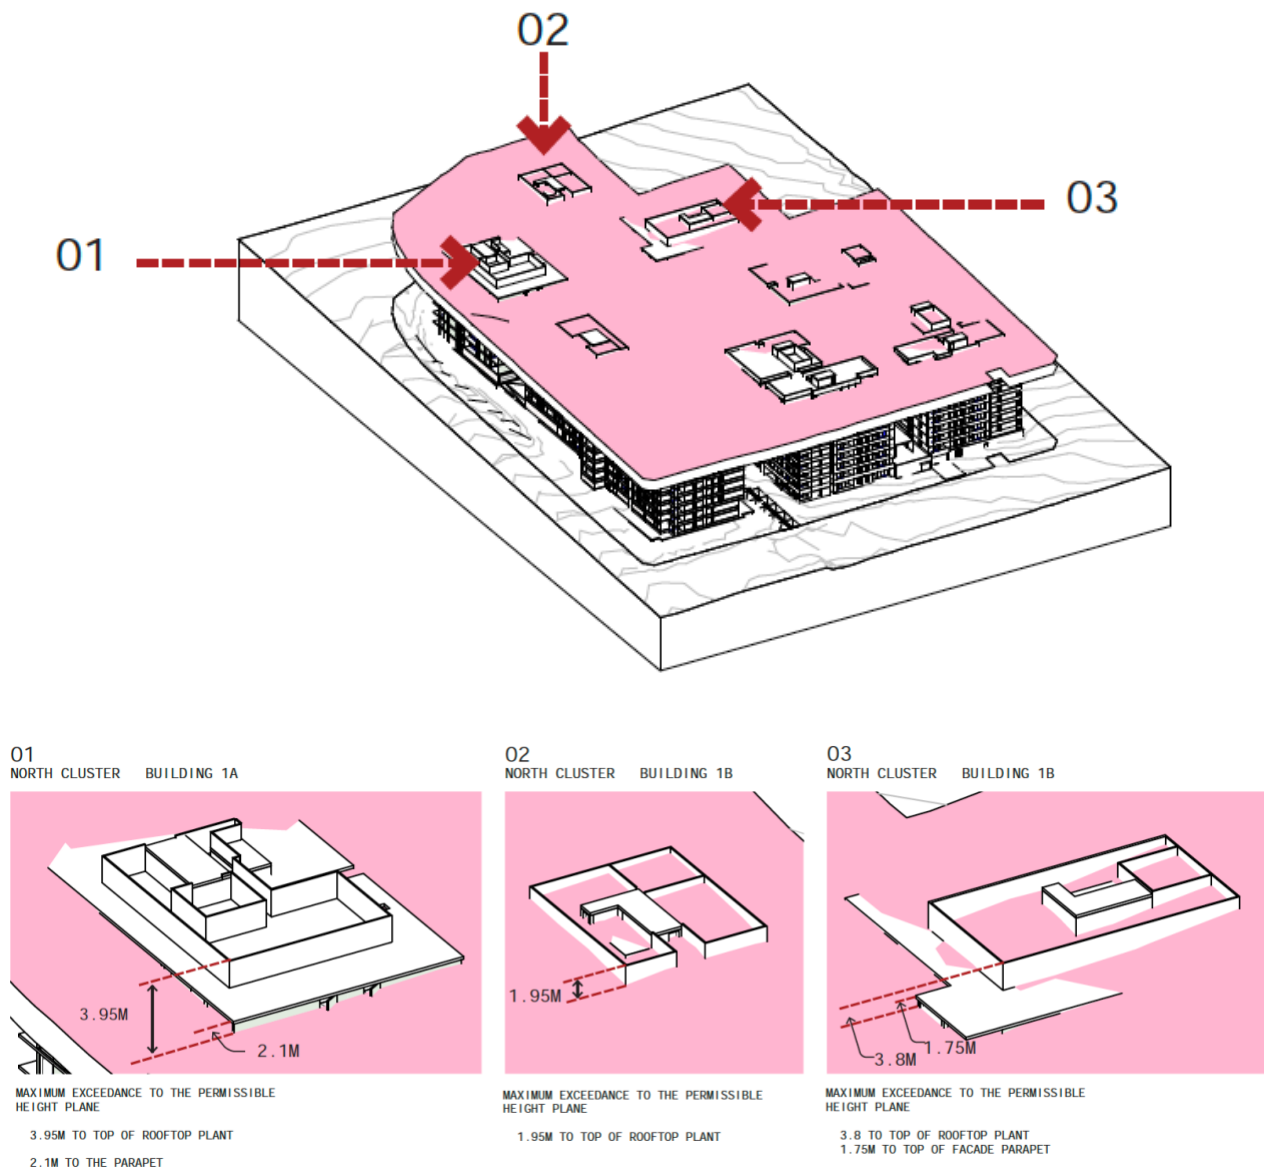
Proposed extent of height exceedance for Building 1 – North (Source: BVN)
